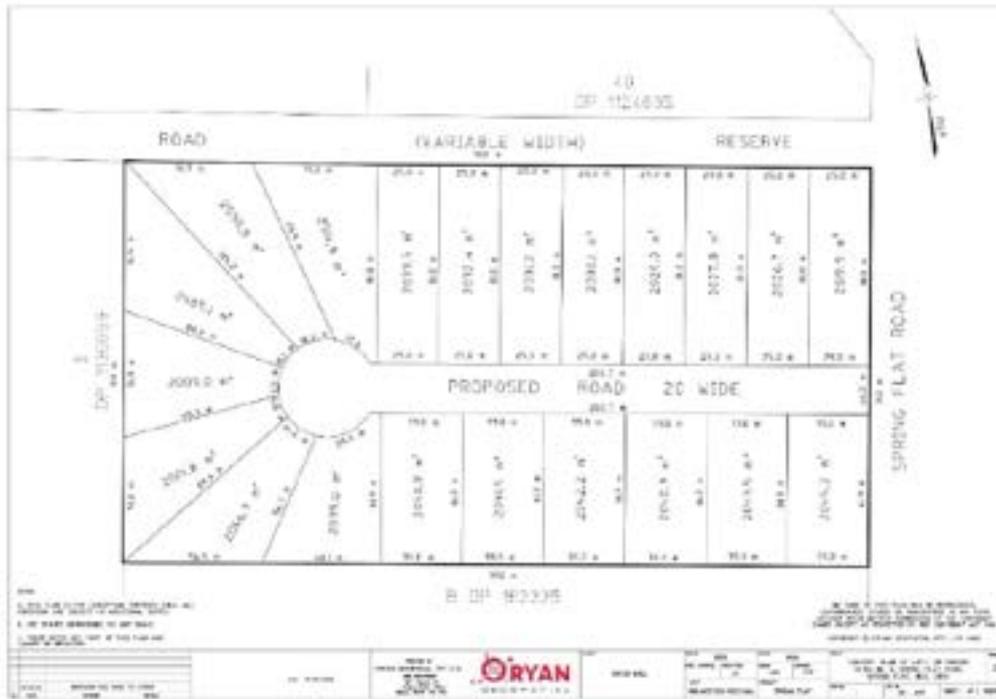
Planning Proposal Concept Plan for Future Site Subdivision: 16 Spring Flat Road, Spring Flat
